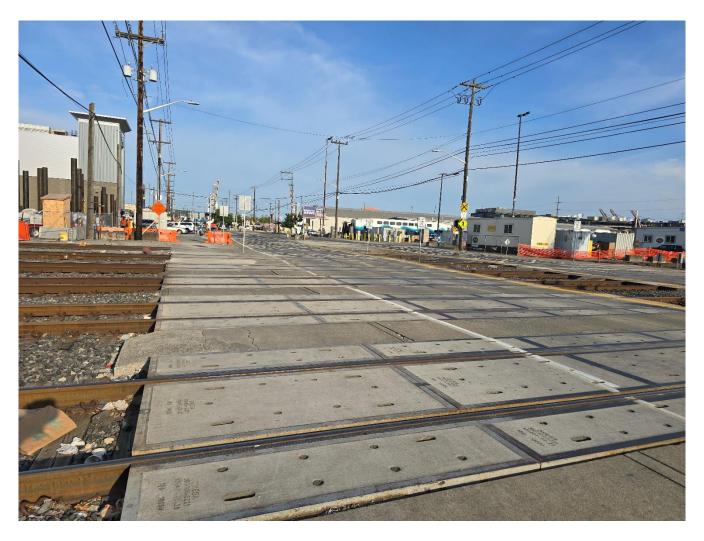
S HOLGATE ST AND DOT# 927461X CROSSING, PAVEMENT CONDITION SHOWING FAILURE OF PAVEMENT BETWEEN RAIL CROSSING, SE CORNER LOOKING NW
